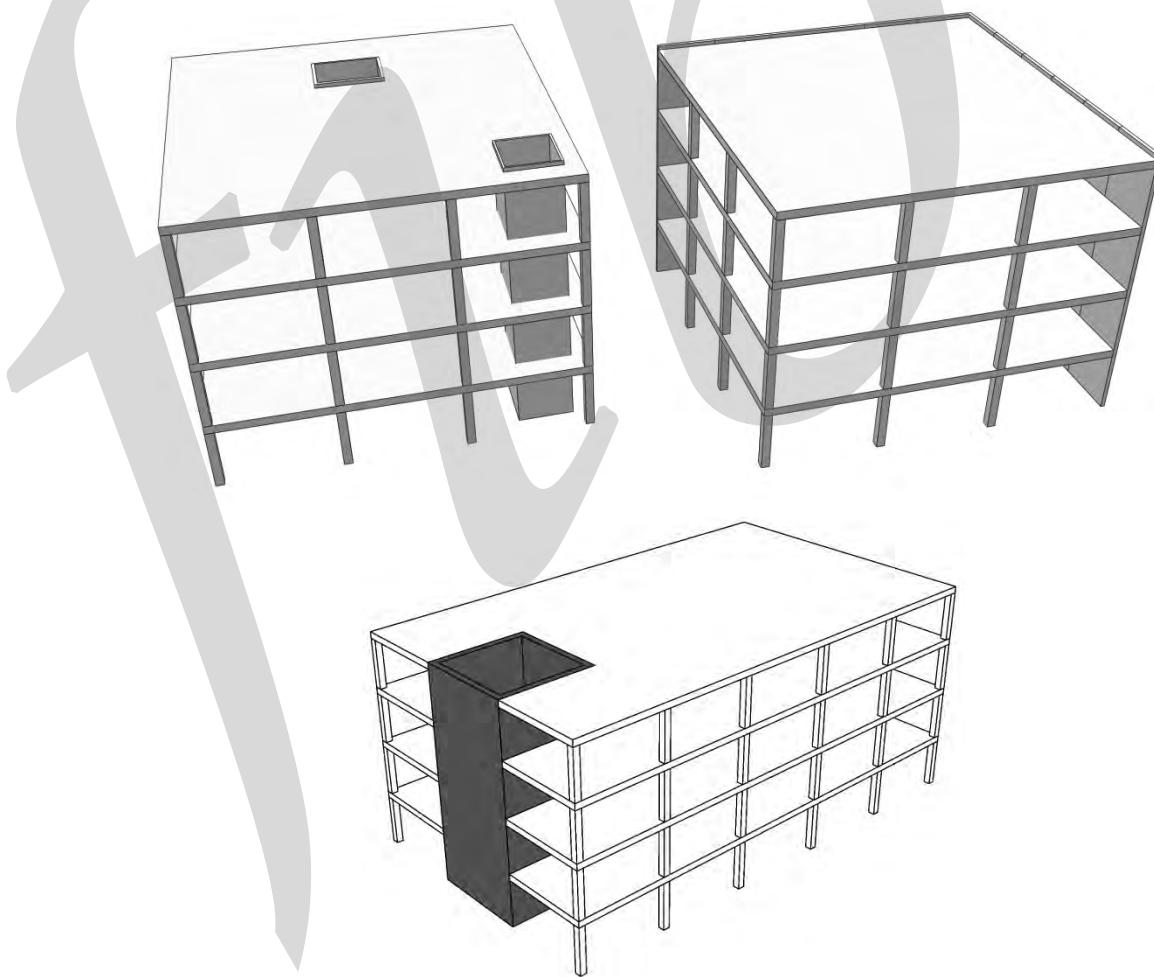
Shear wall configuration should be avoided since such walls are not symmetrical in plan on the two orthogonal axes [37]
